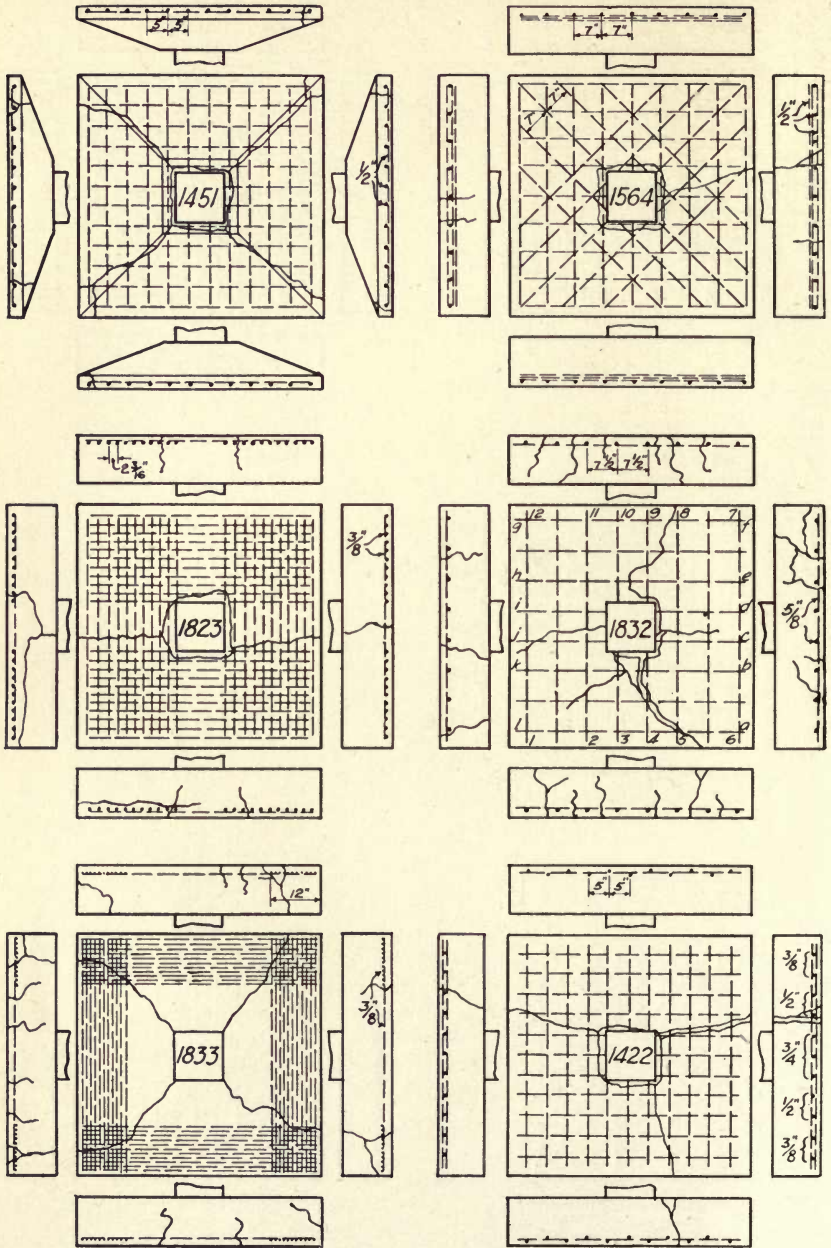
REINFORCED CONCRETE COLUMN FOOTINGS.
